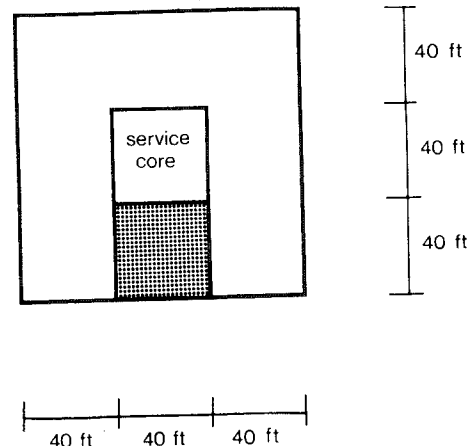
Plan of typical floor of building for which the floor-ceiling sandwich is to be designed.
